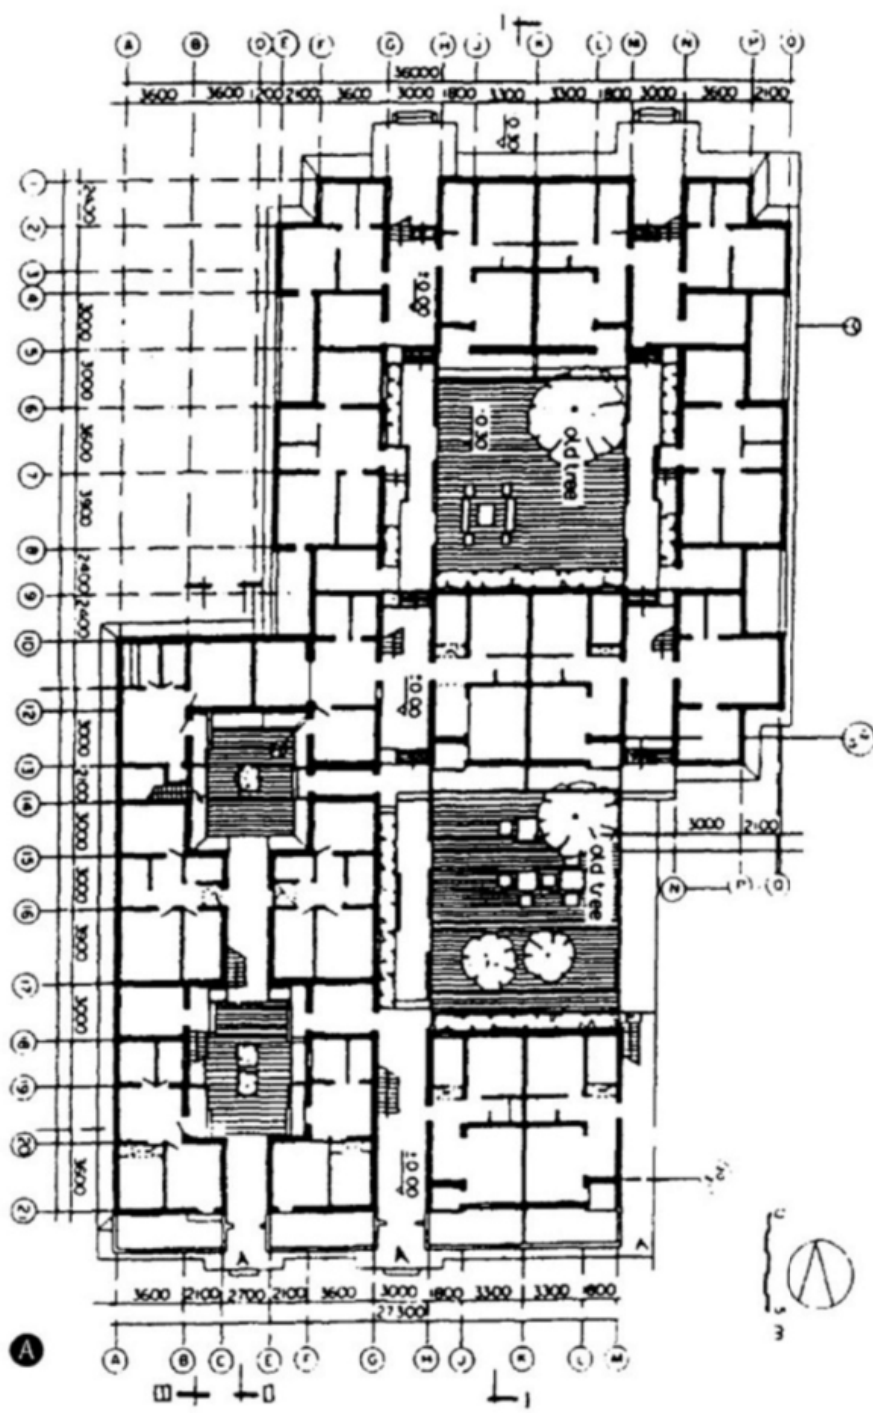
Plan of the ground floor of No. 41 courtyard.
